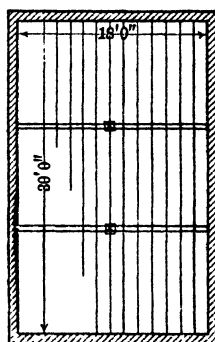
Joists Parallel to Longer Dimension and Supported by Two Girders at Third Points of Span
